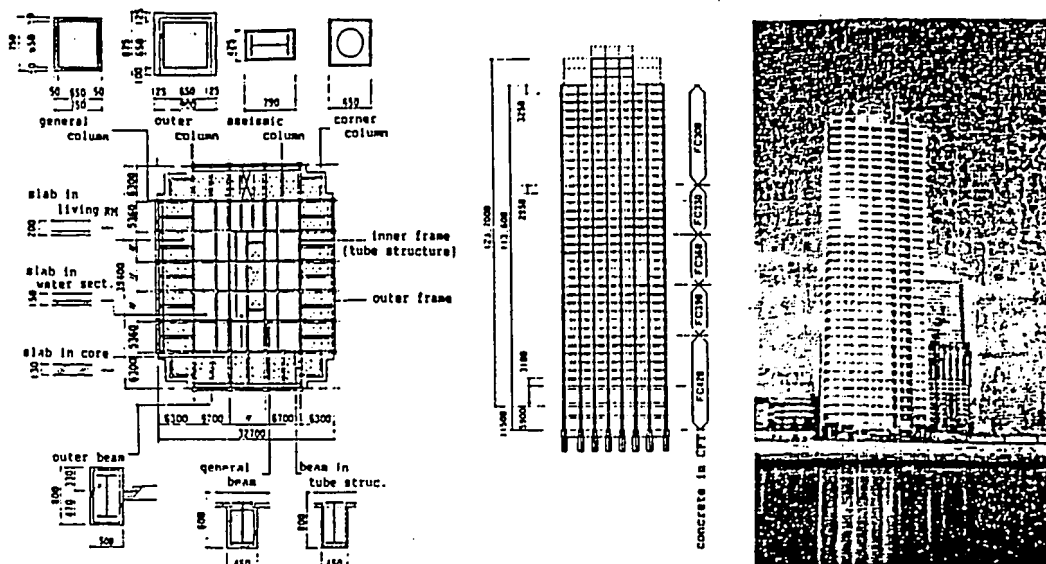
CFT Column High Rise Condominium, Tokyo [Endoh et al., 1991]
